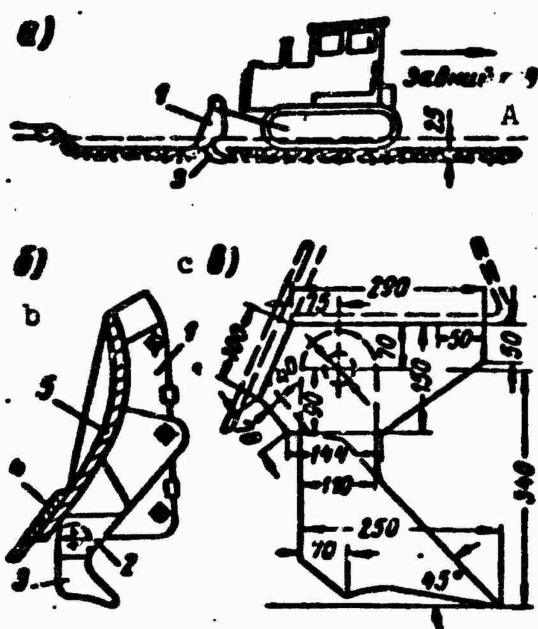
Scheme of soil cutting by a bulldozer with a ripper (Miroshnichenko's design): a) General view; b) blade with ripper tooth, c) ripper tooth with frame; 1) side wall of blade; 2) frame flange; 3) ripper tooth; 4) blade knife; 5) front wall of blade; A) reverse motion.
